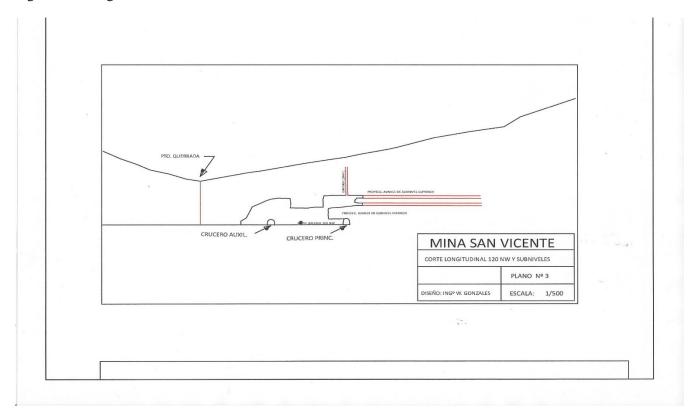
Longitudinal Plan of 100 NW Sublevels
